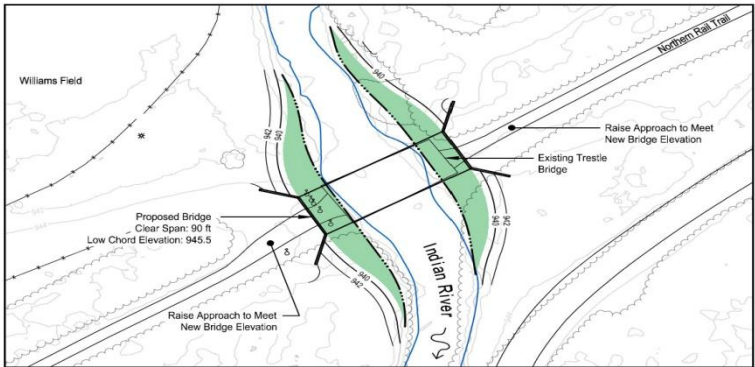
Conceptual site plan for 90-foot clear span bridge at the upstream Rail Trail crossing
